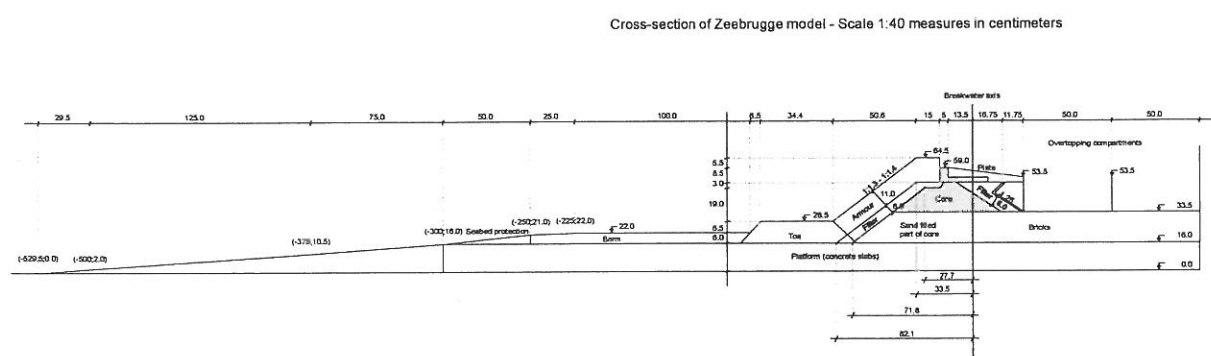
Cross section of the Zeebrugge breakwater model in scale 1:40.
